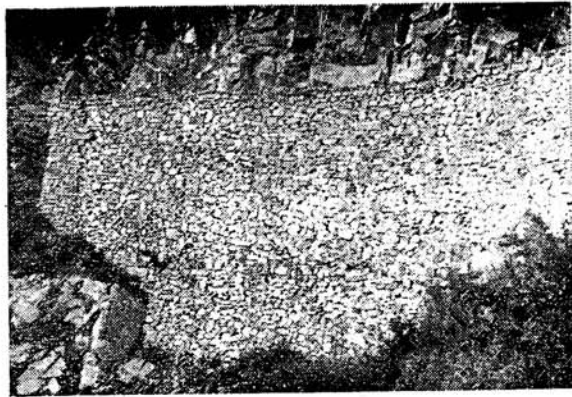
8.5 m high dry stone masonry retaining wall in fractured very hard rock zone with 2.5 m high toe wall, projecting out by 0.3 m. It is visible in photo below dry stone Kharanja
